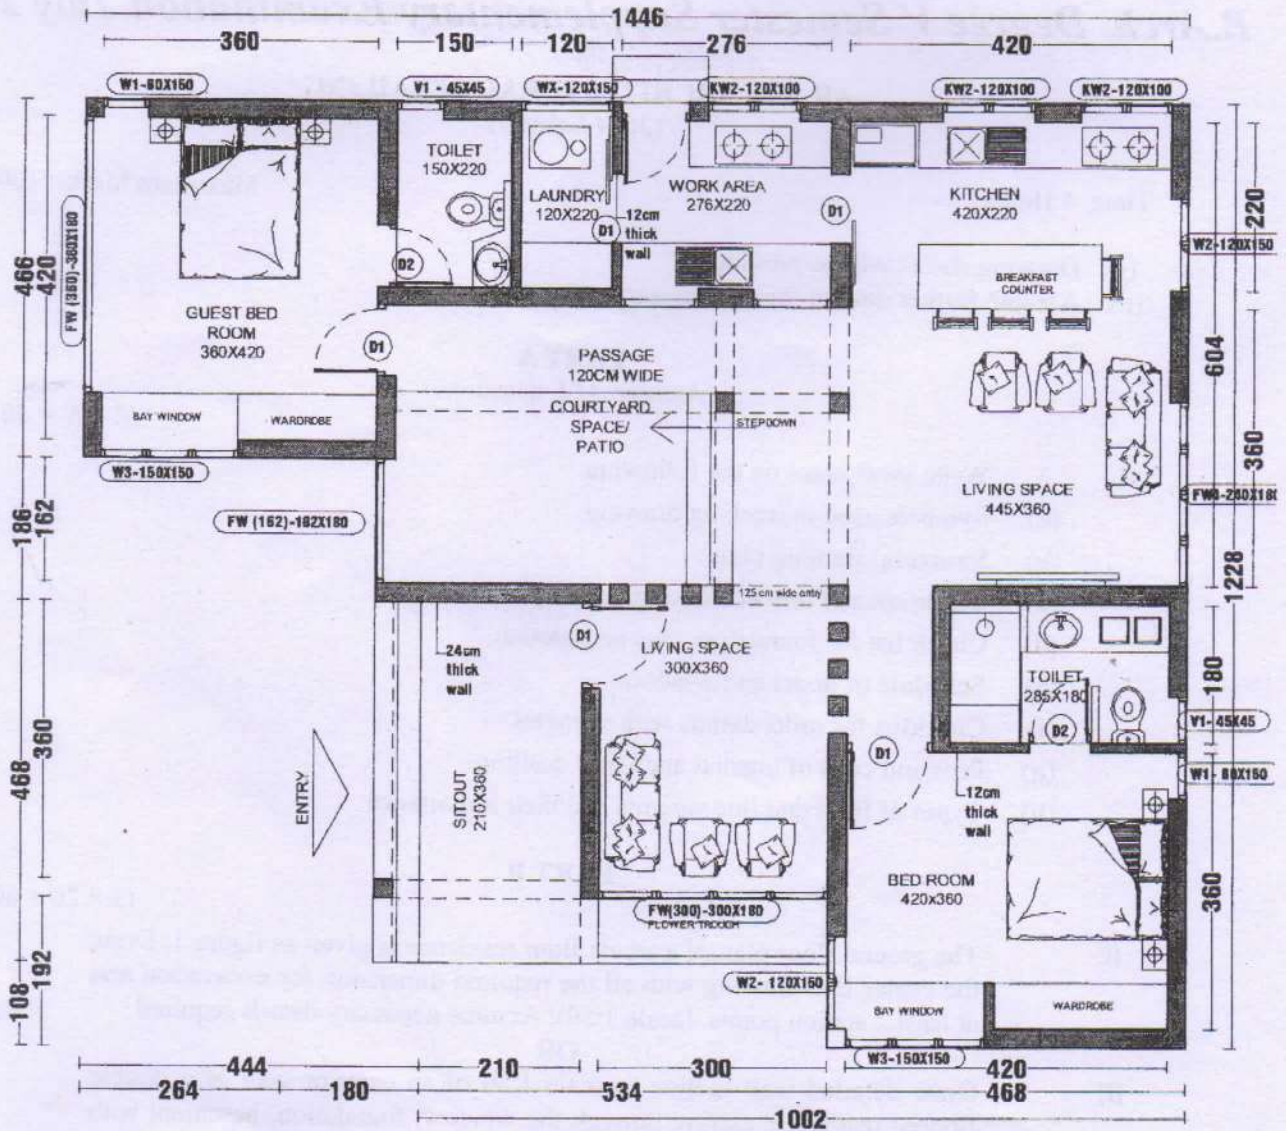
Ground Floor Plan. (Two brick wall thickness – 24 cm, 1 brick wall thickness – 12 cm)
